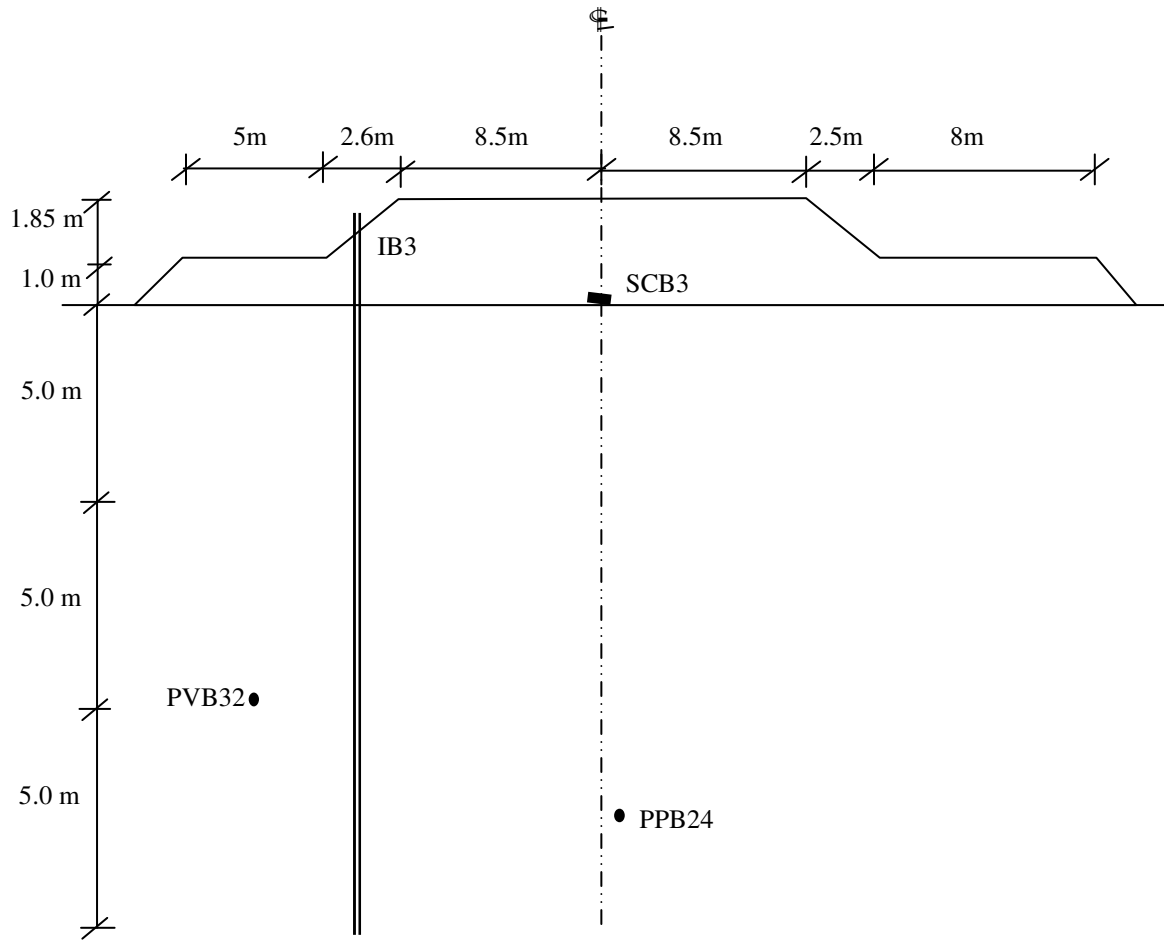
Instrumentation Layout for Section B (Elevation View)
